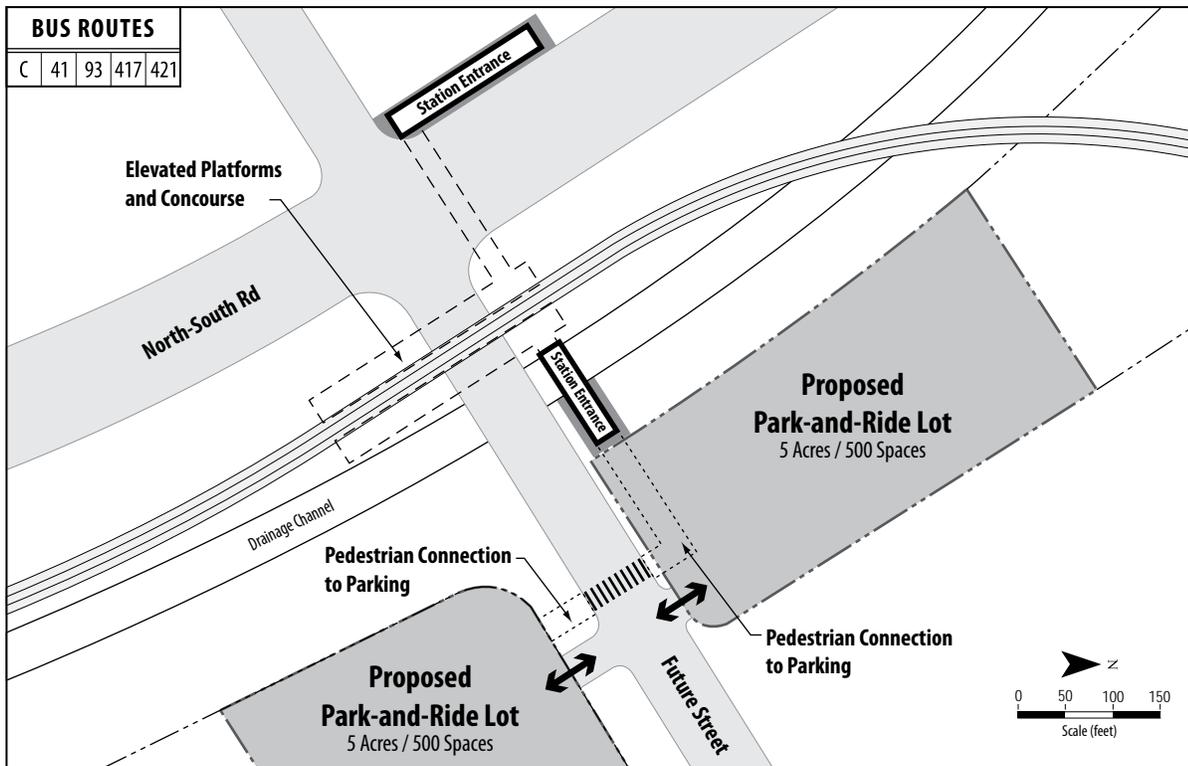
UH West O'ahu Station (All Build Alternatives)
